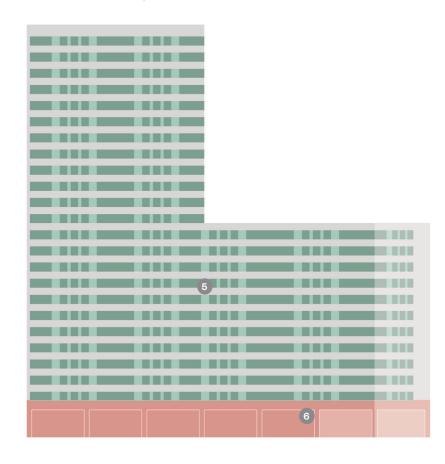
Building C (Enterprise Yard side) - façade principles O2 (Illustrative)
